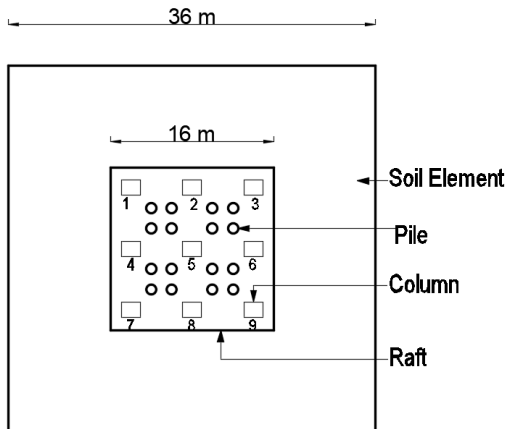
Position of Piles in Piled Raft Foundation-Type D- Pile at one-third of bay (16 nos. of piles)
